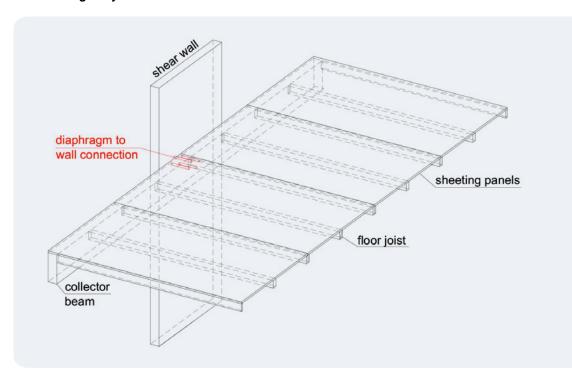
Scheme of a typical diaphragm-to-wall connection.
